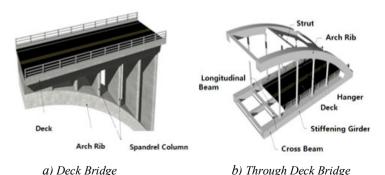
Deck Arch Bridge and Through Deck Bridge.
